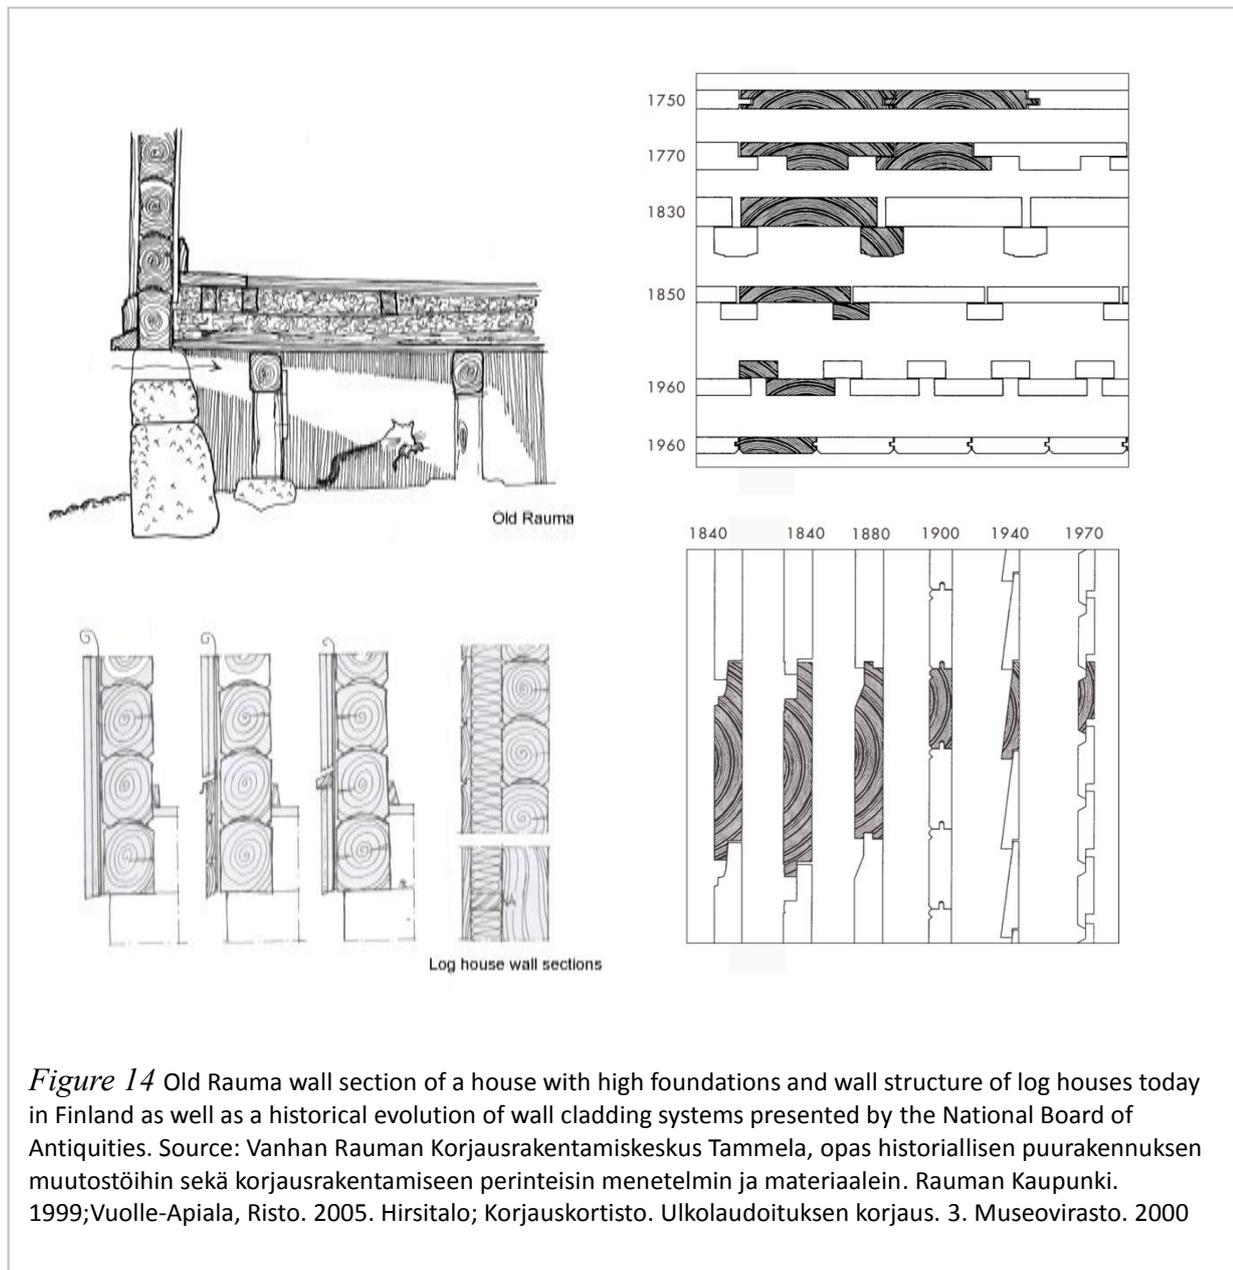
Old Rauma wall section of a house with high foundations and wall structure of log houses today in Finland as well as a historical evolution of wall cladding systems presented by the National Board of Antiquities. Source: Vanhan Rauman Korjausrakentamiskeskus Tammela, opas historiallisen puurakennuksen muutostöihin sekä korjausrakentamiseen perinteisin menetelmin ja materiaalein. Rauman Kaupunki. 1999; Vuolle-Apiala, Risto. 2005. Hirsitalo; Korjauskortisto. Ulkolaudoituksen korjaus. 3. Museovirasto. 2000
